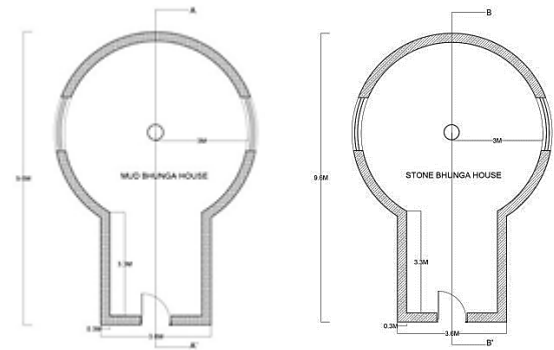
Plan of study models with mud wall (left) and stone wall (right side).
